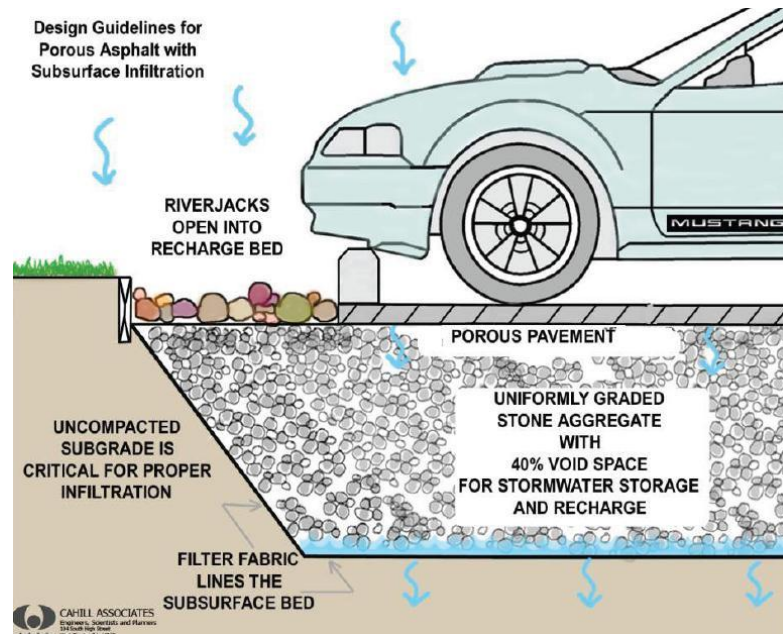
Pervious concrete system profile (Cahill / PADEP, 2006)
